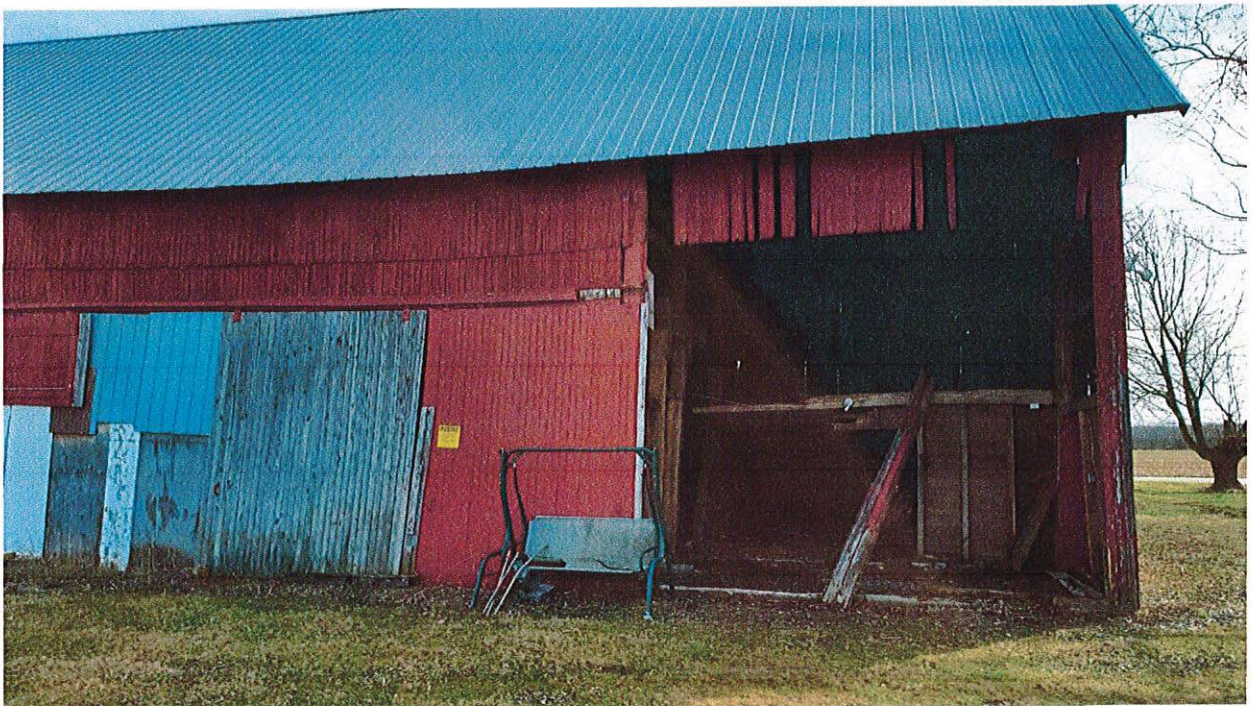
Missing west wall of barn from recent 2024 wind storm.
